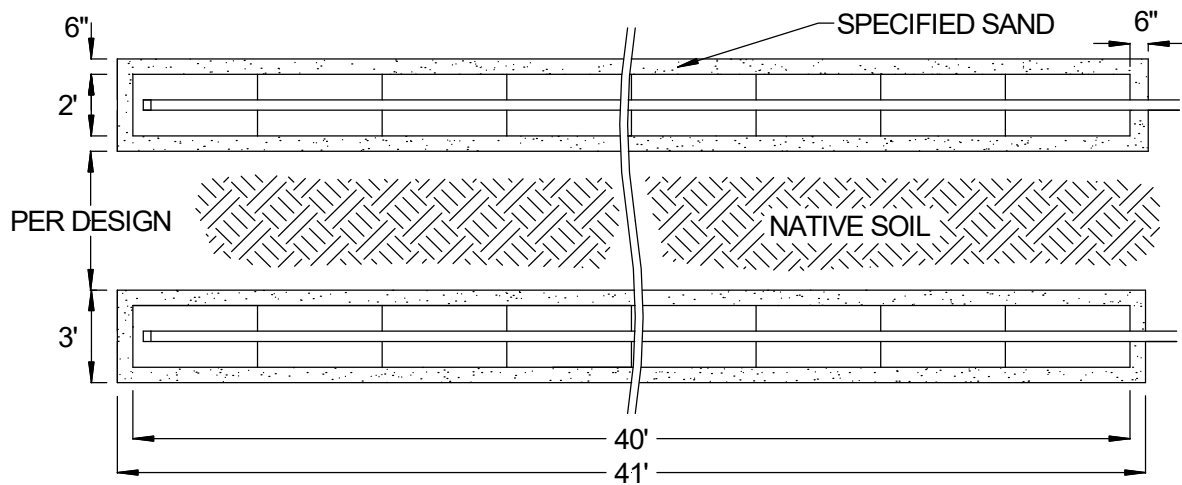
SECTION VIEW – TRENCH SYSTEM – LEVEL SITE
